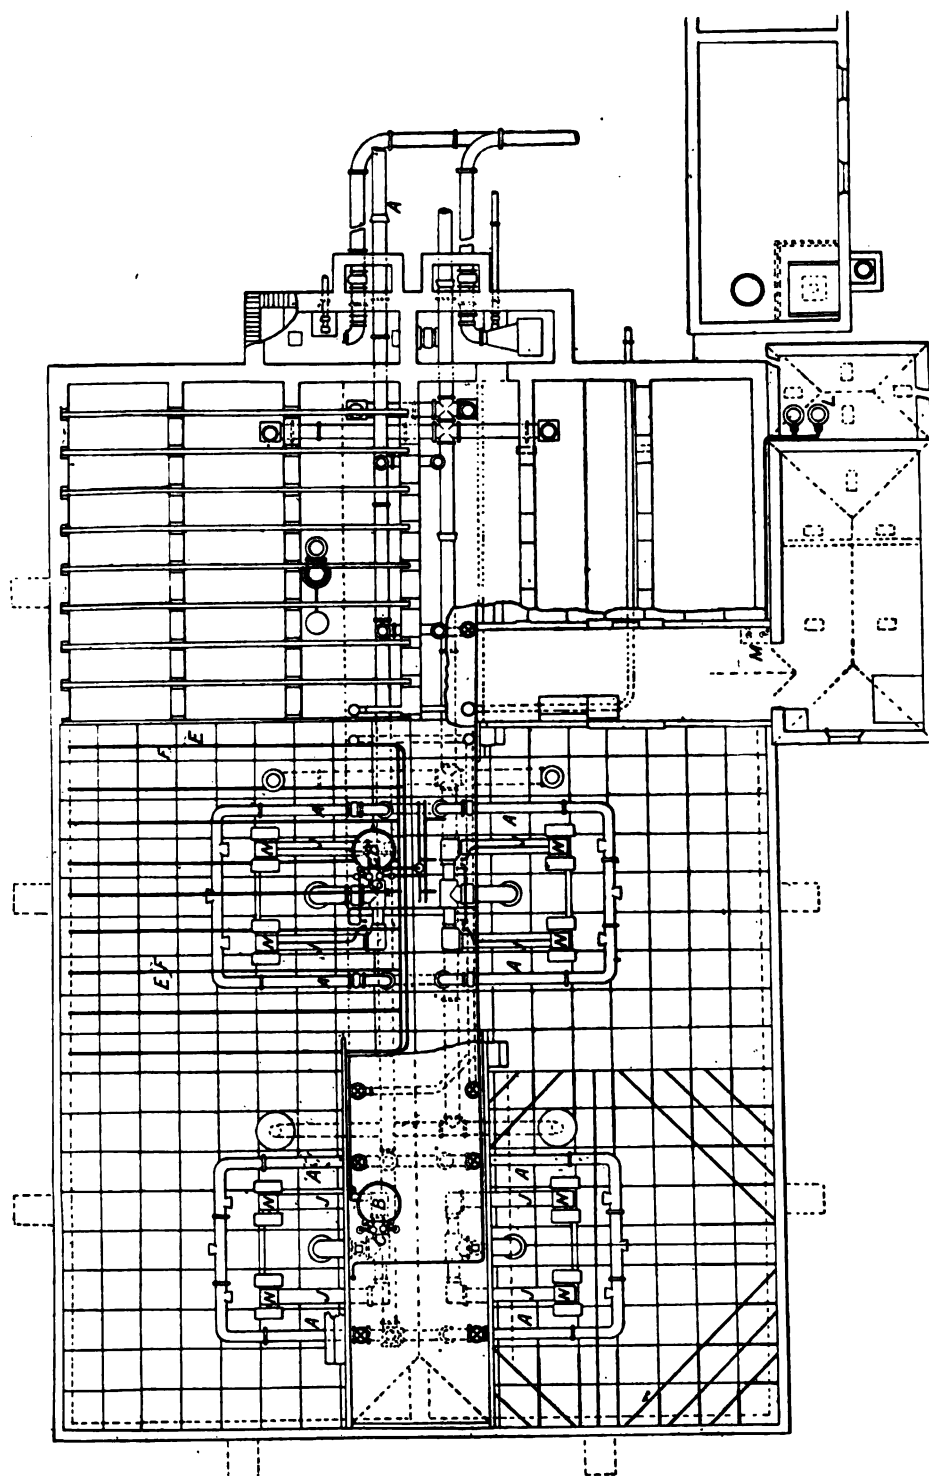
Water-Softening Plant at Ilkeston. (Plan View.)
